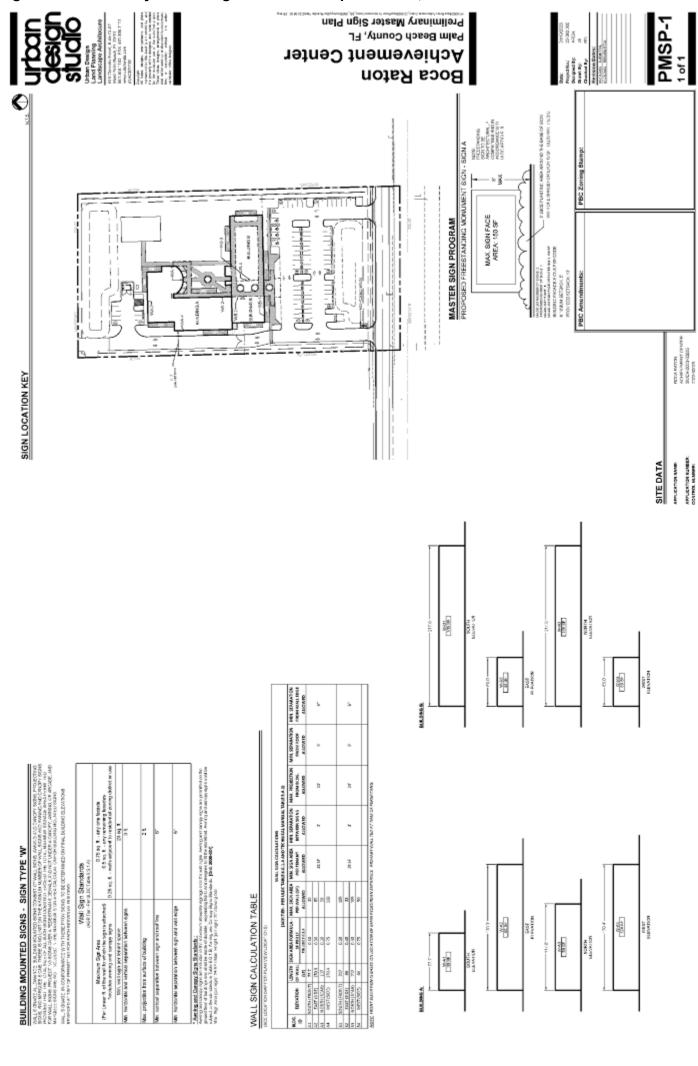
Preliminary Master Sign Plan dated September 25, 2023
